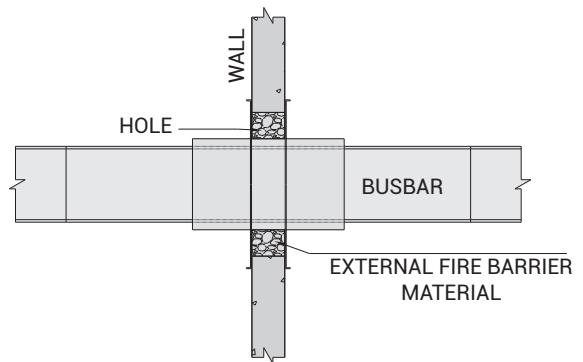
SAMPLE WALL CROSSING WITH FIRE BARRIER
